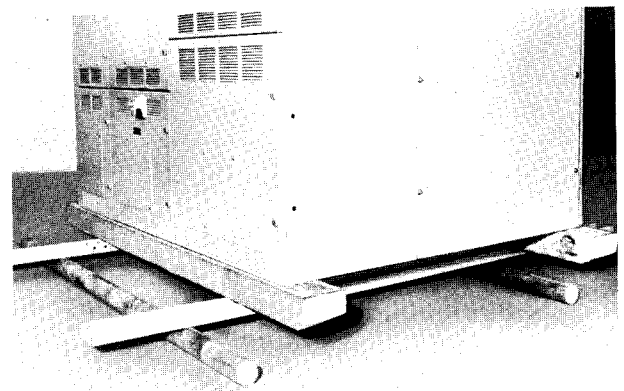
Jacks Removed and Switchgear Ready for Lateral Moving
